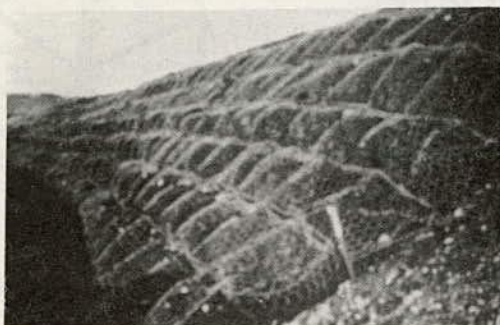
Wall to contain fill at bridge abutment on the Snoqualmie Pass.
